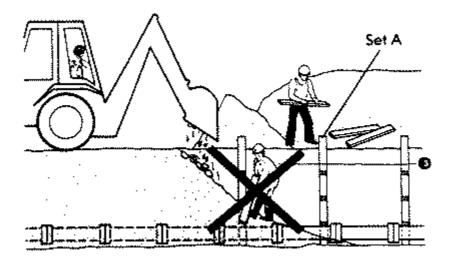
REMOVING SOLDIER SET GROUND SUPPORTS, METHOD 1
